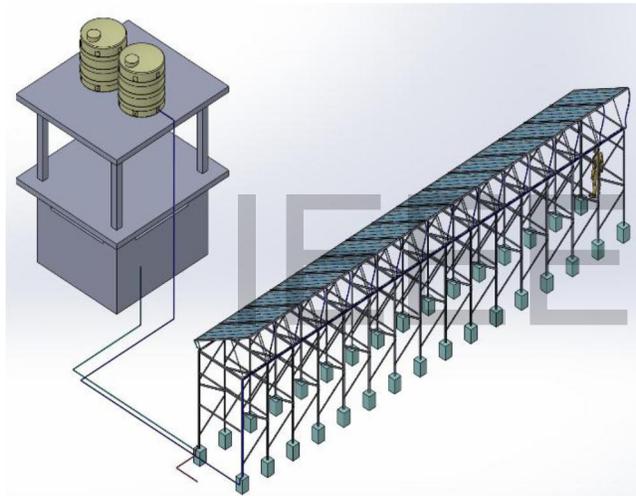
Pilot plant scheme from Fiestas et.al. [95]
